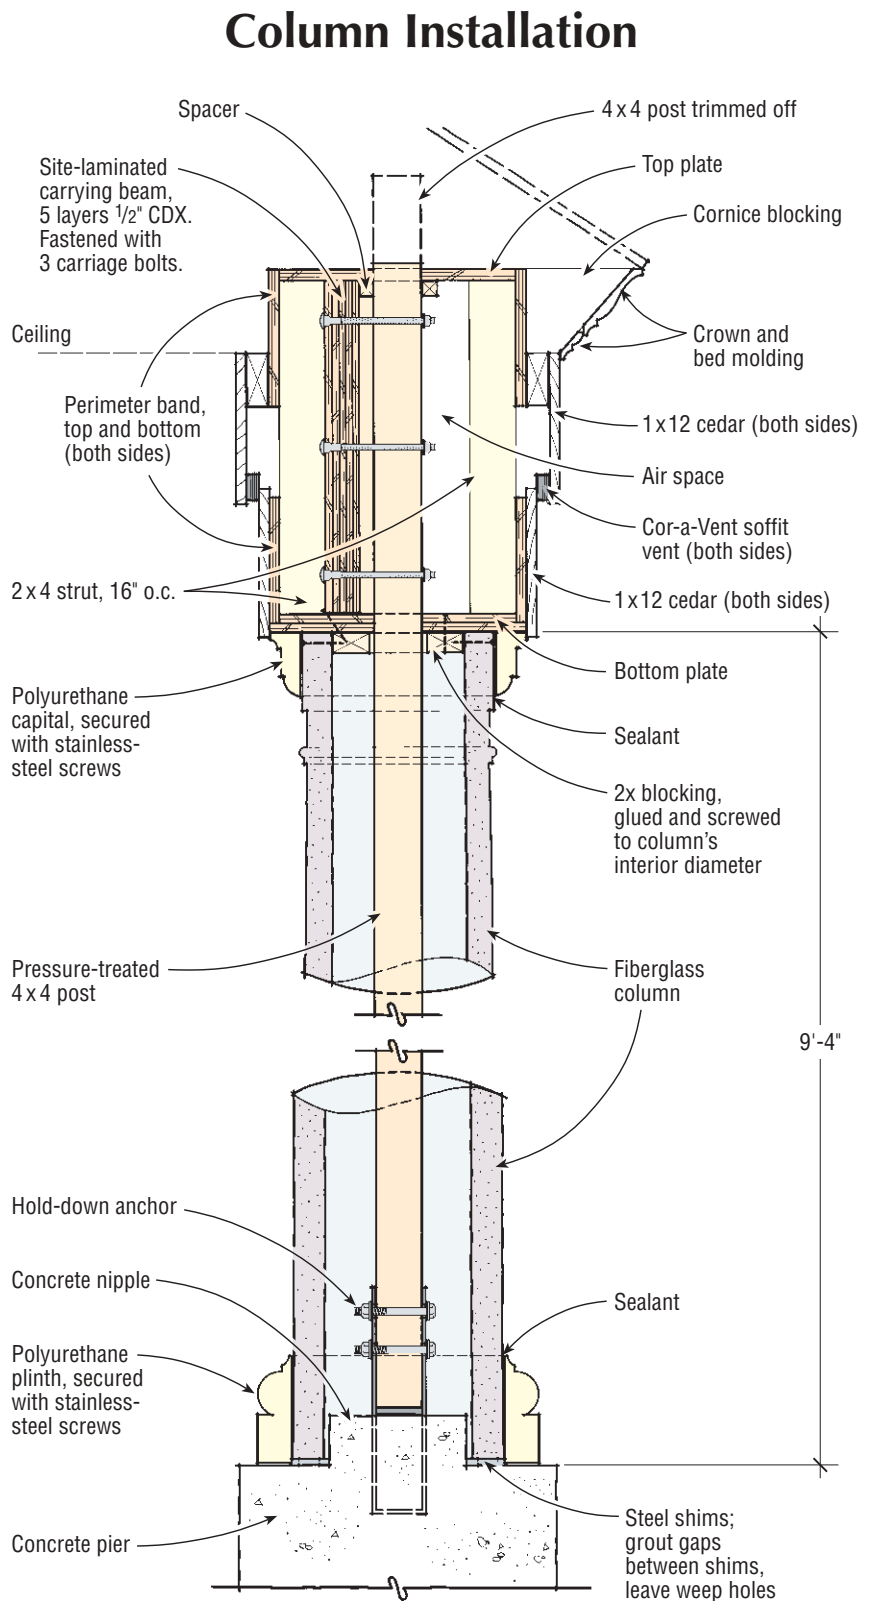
The composite beams were built around a glue-laminated plywood web, 2 1/2 inches thick by 28 inches high. The overall 19-inch width of the beam accommodated the columns' square capitals. Four pieces of wood blocking, shaped, glued, and screwed to the top interior of each column, provide an attachment for wood screws driven down through the beam's bottom flange.
